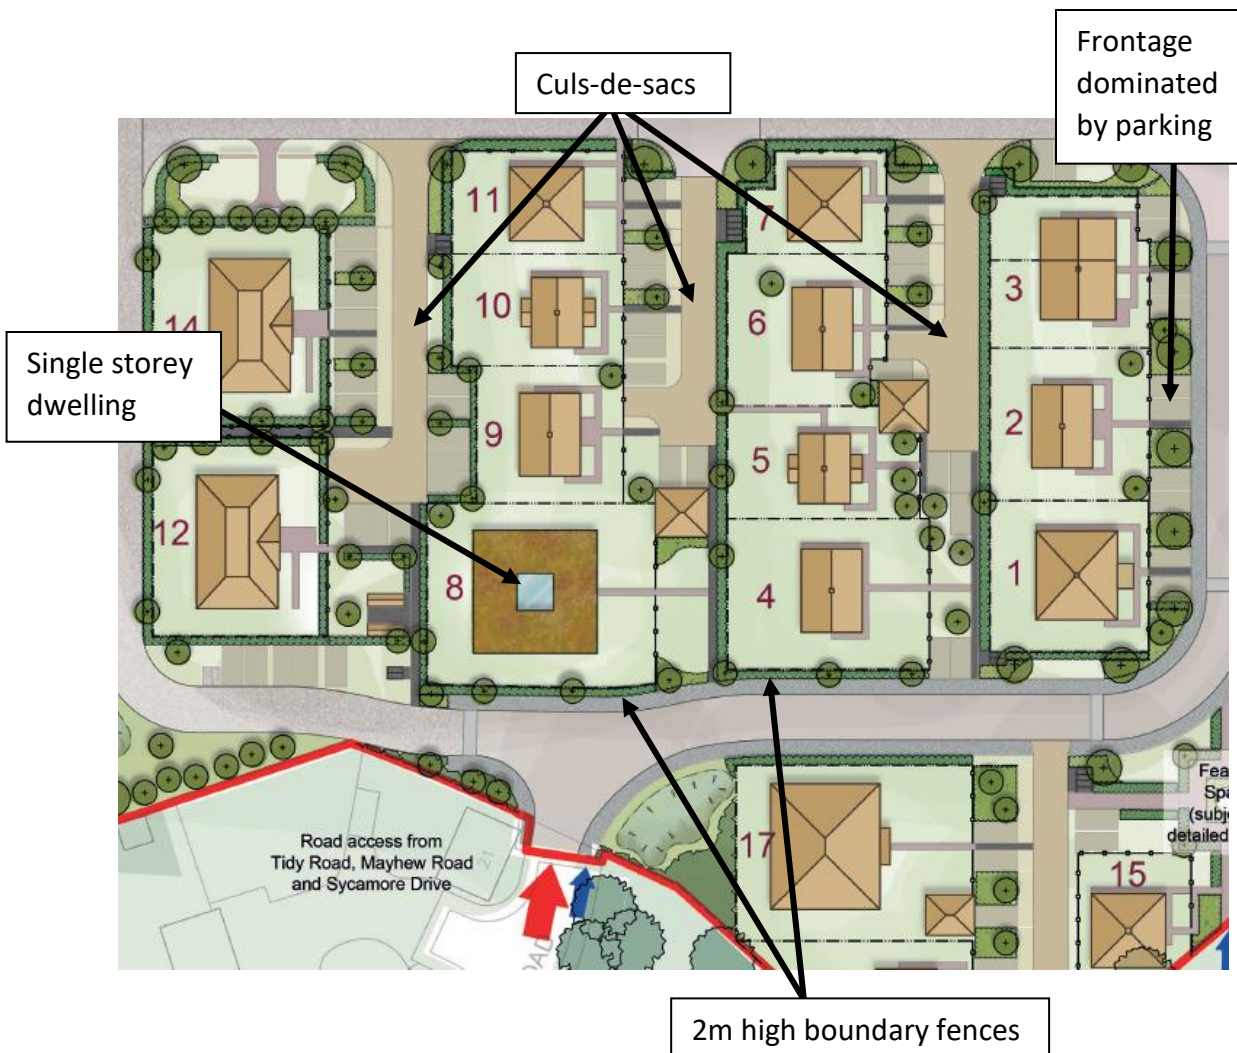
Extract from Site Layout Plan to show the Tidy Road entrance to the site
